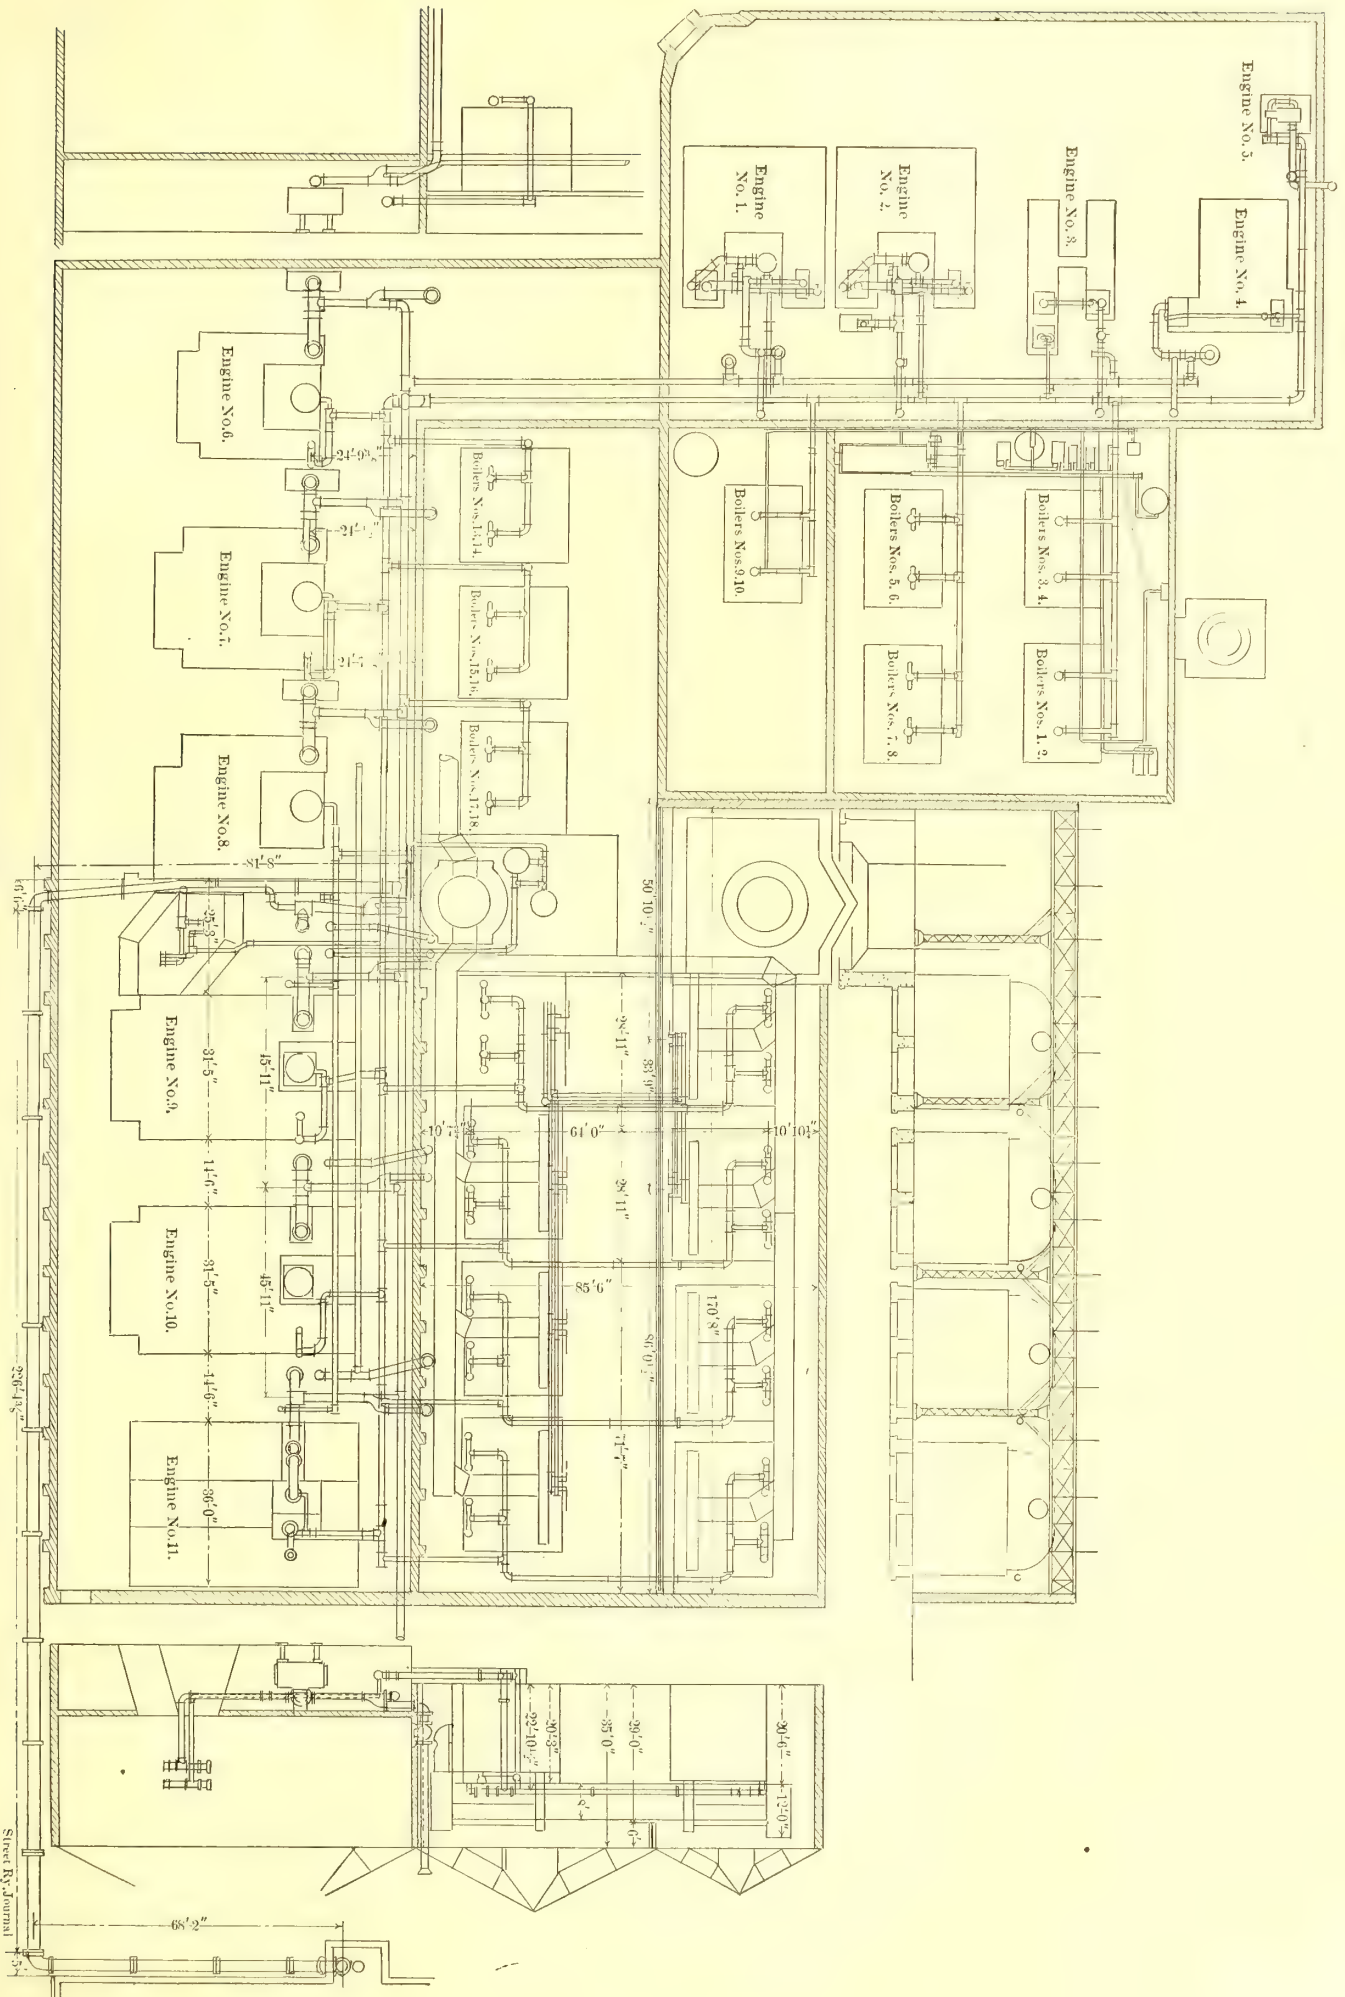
PLAN AND SECTIONS OF POWER STATION, SHOWING OLD AND NEW PARTS
